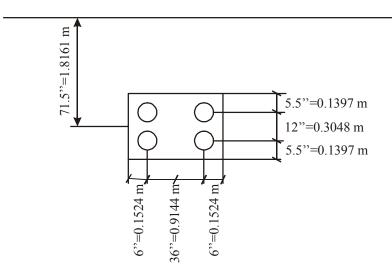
, Assumed trench cross section, two HVDC Light bipolar circuits
